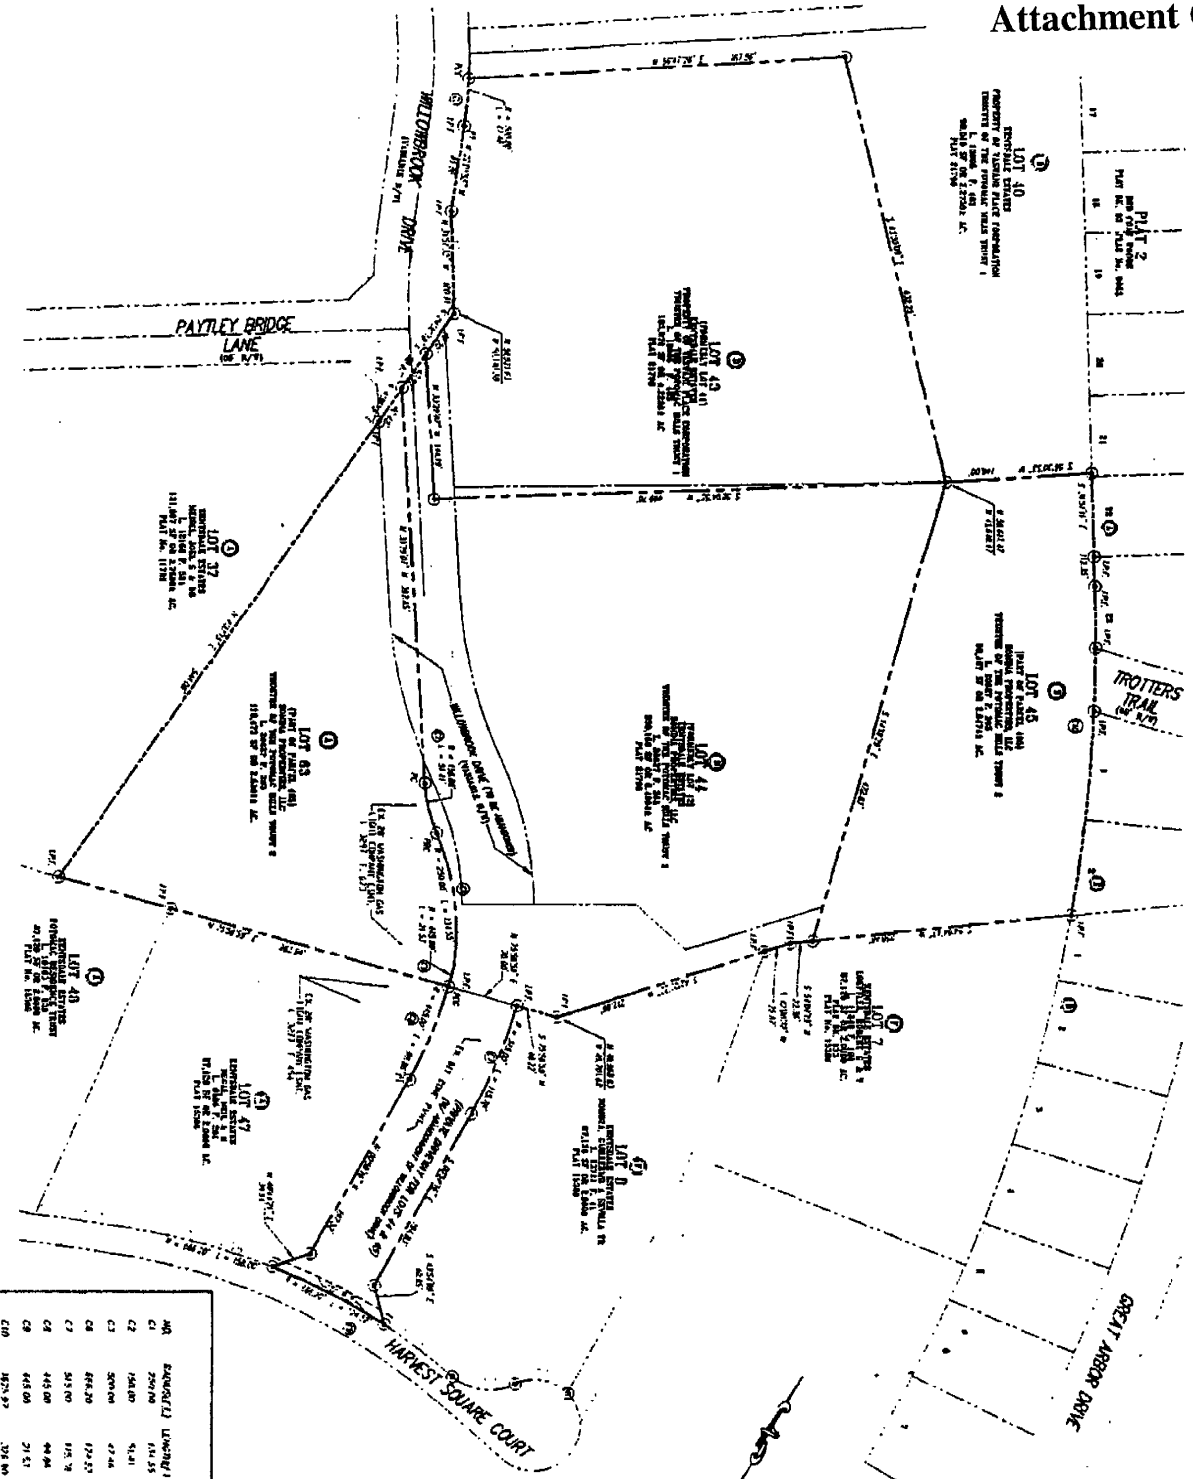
EXHIBIT "A"		ABANDONMENT PLAN		WILLOWBROOK DRIVE		DESIGN ENGINEERING INCORPORATED
